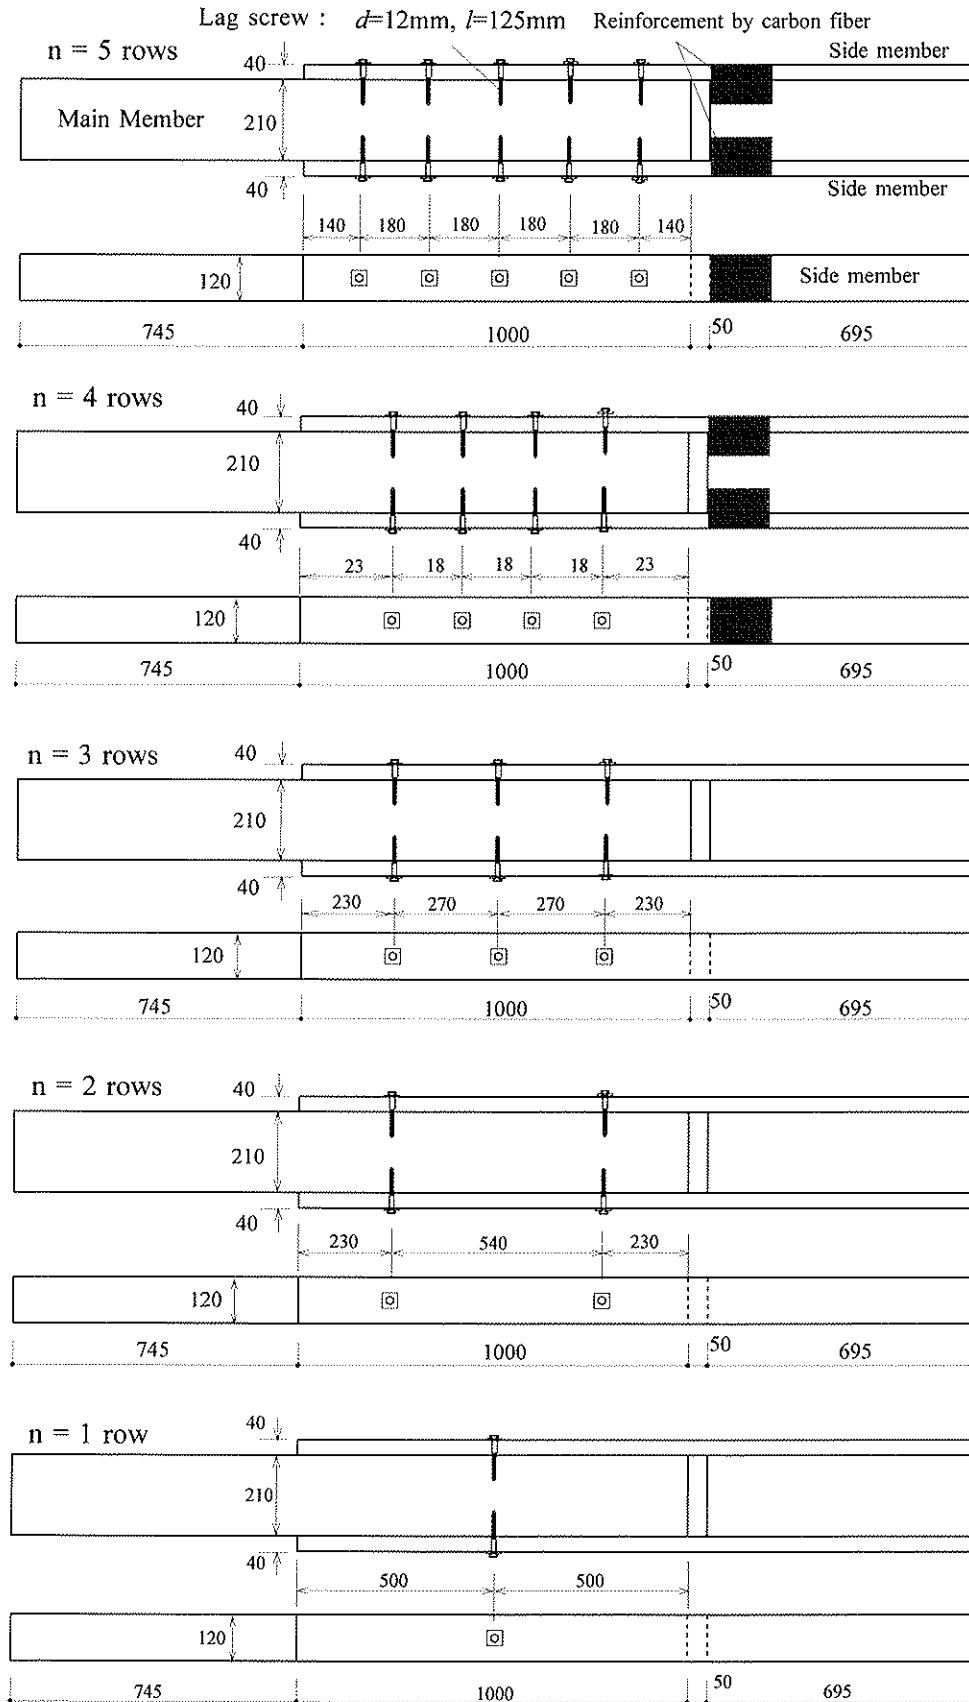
Test Specimens for Multiple Lag Screwed Timber To Timber Joints.
